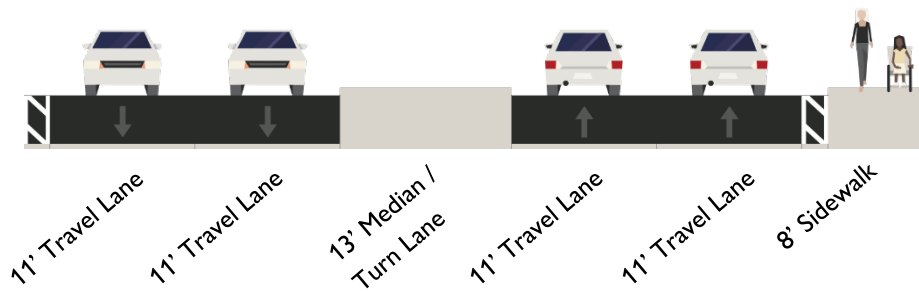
Highway 2 Typical Cross-section – E. 72nd to Quebec
